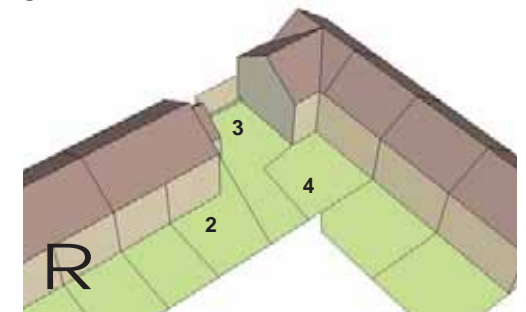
By extending plot 3 to turn the corner and setting back plot 2 it provides sufficient space for a garden. By providing plot 2 with a single storey element and an adjoining brick wall, it further assists with maintaining a built frontage.
